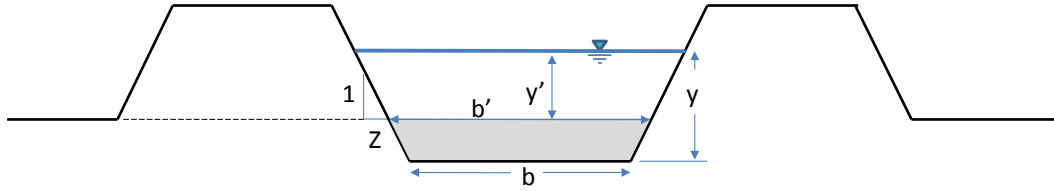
Partial fill canal section illustrating the portion of the cross section ( $b'$  and  $y'$ ) that sits above the surrounding ground elevation and can contribute to a breach outflow flood.
